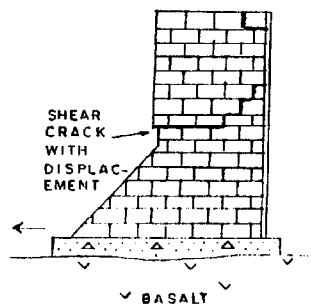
Damage to a masonry pier of a barrage across Tirna river.
